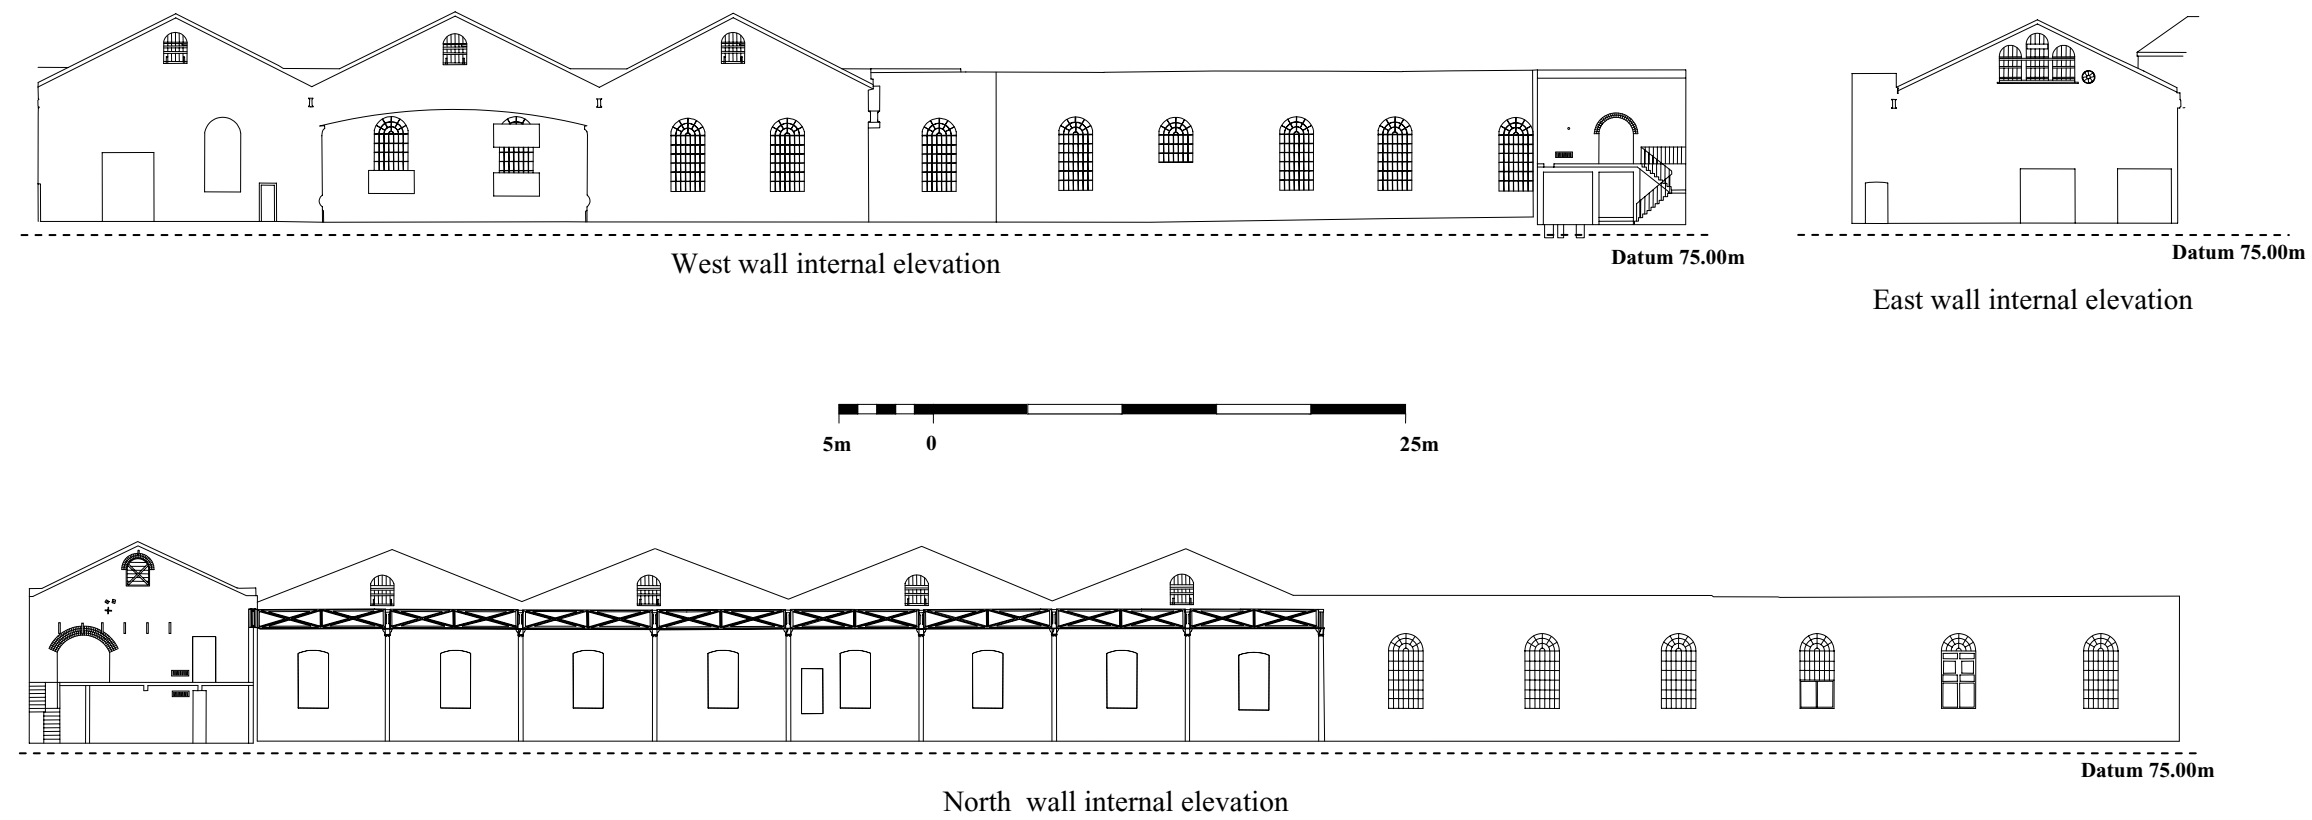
Triangular building internal elevations (based on drawing ref: Triangle building floorplans OS grid_R11.dwg supplied by Willmott Dixon)
